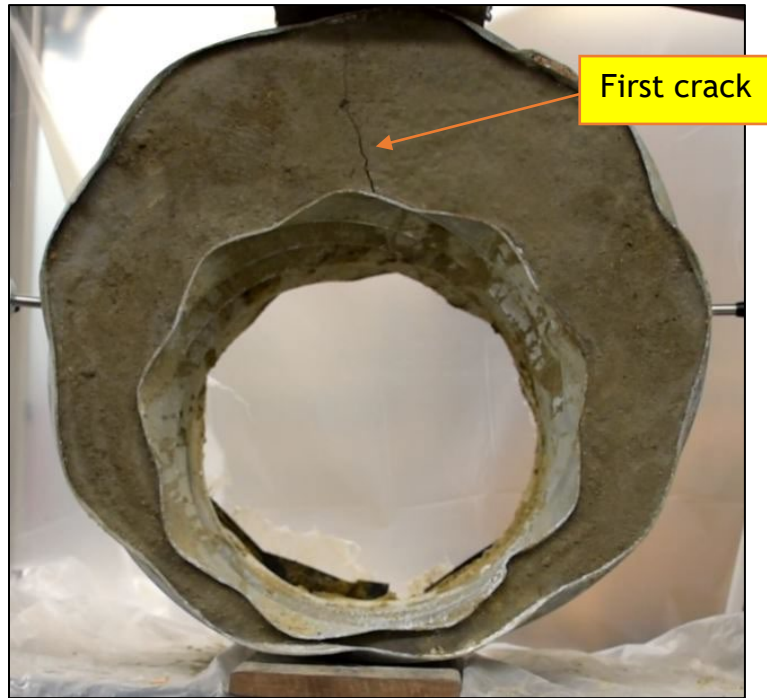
First Crack in Culvert with No Voids Grouted with Mix A (at 1300 lbf).
